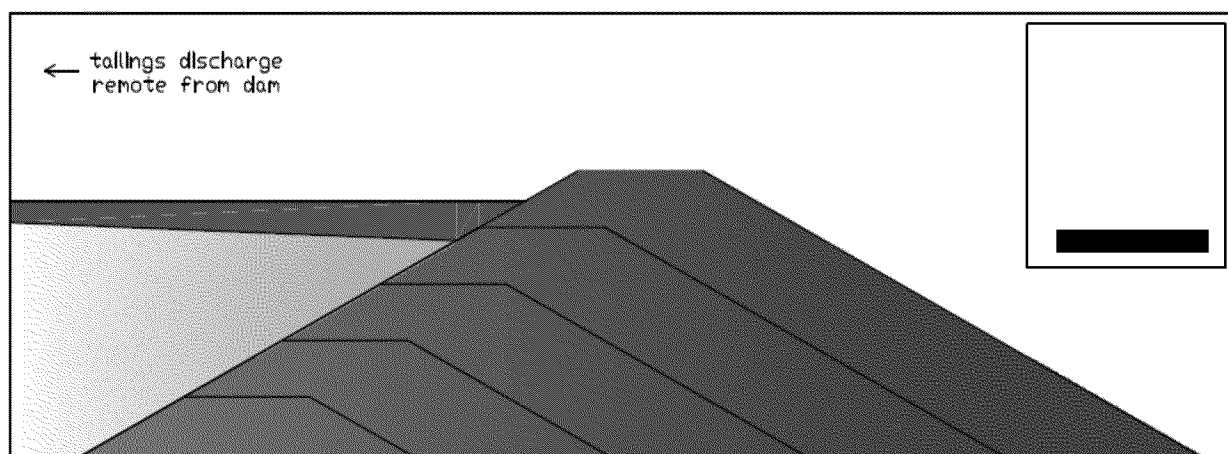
Downstream Tailings Dam Embankment Construction Method with Remote Tailings Discharge
